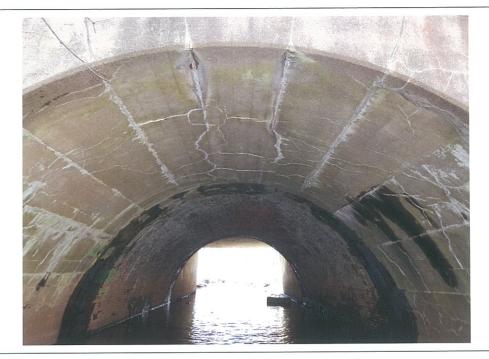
General view of intrados of concrete and brick arches, looking south. Note several fine cracks with efflorescence, water staining and active water leakage at the concrete arch intrados. Note also, heavy efflorescence throughout the brick arch.
